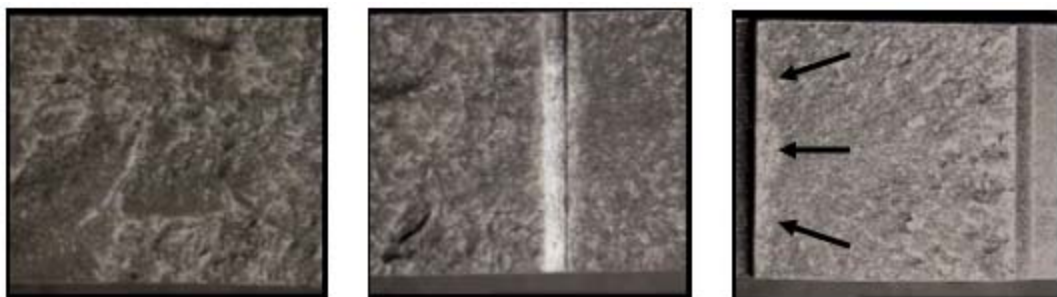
Fracture surfaces for specimens type A, B and D.
